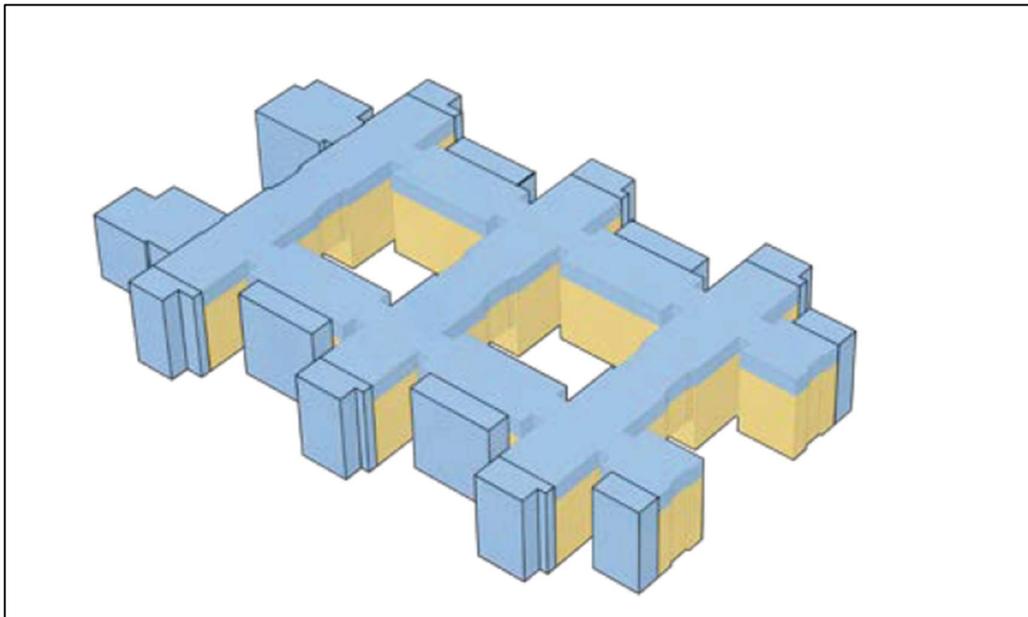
Stage No. 4 of the Proposed Design. New Extensions to all Blocks
